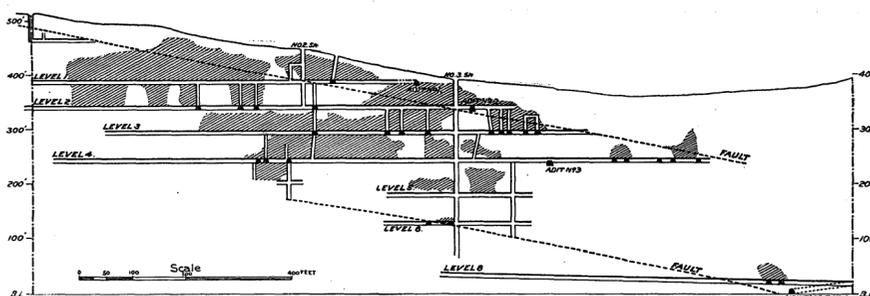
Elevation of Queen of the West mine workings. (Shaded area indicates stoped ground.)
